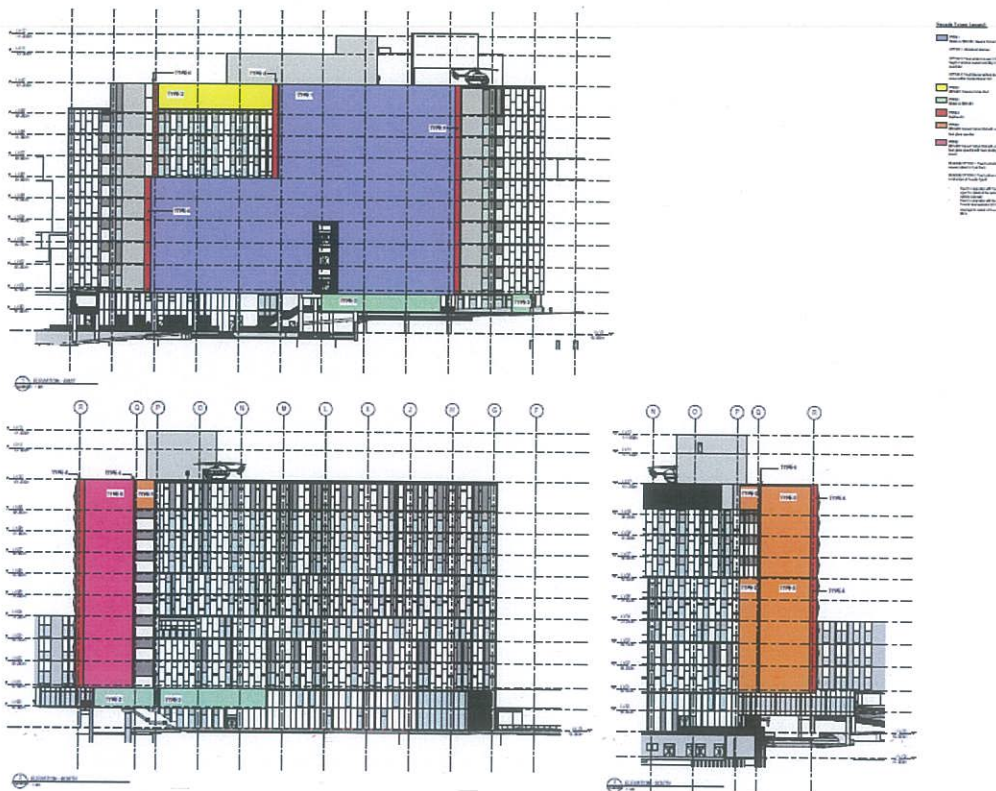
Proposed IASB Elevations (Source: BVN, 2019)
